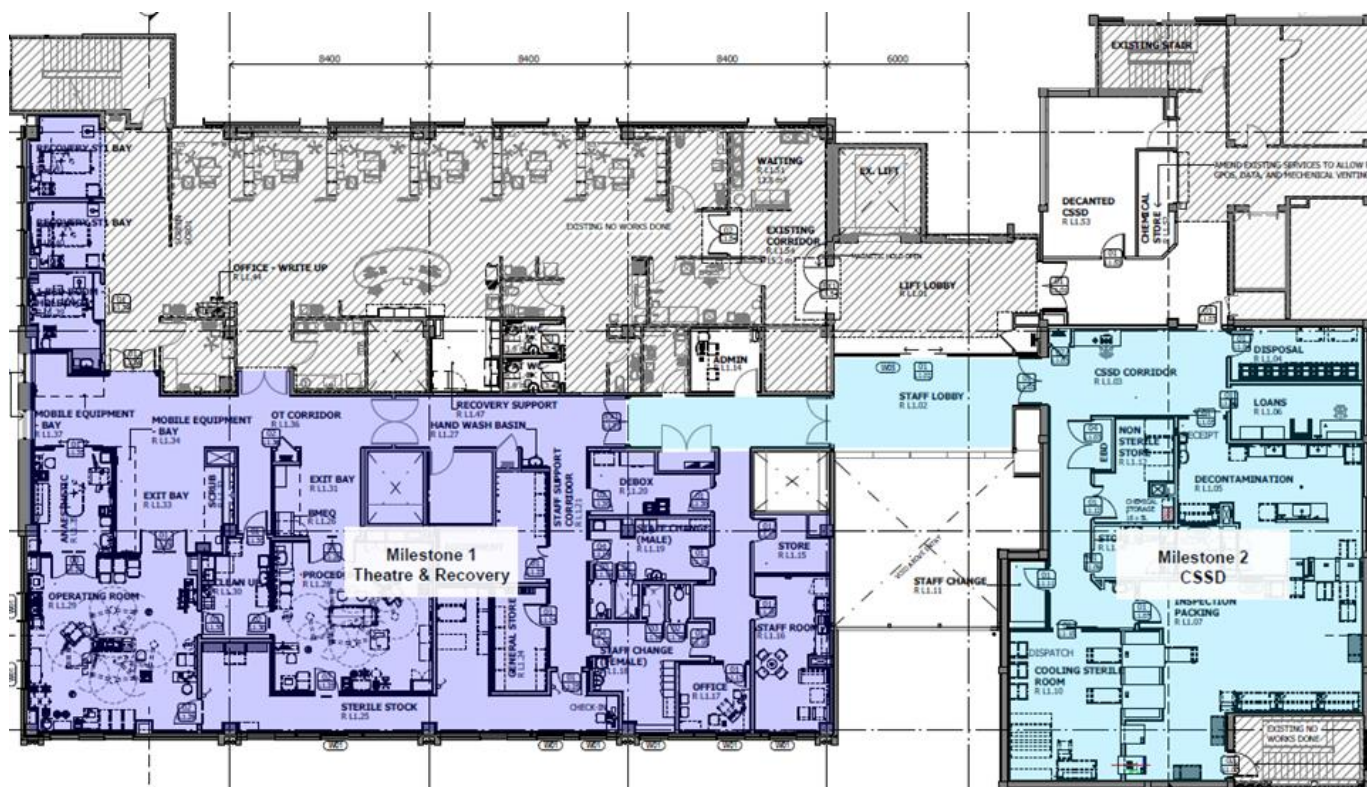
Indicative layout of the proposed works/ Staging plan (dwp)
